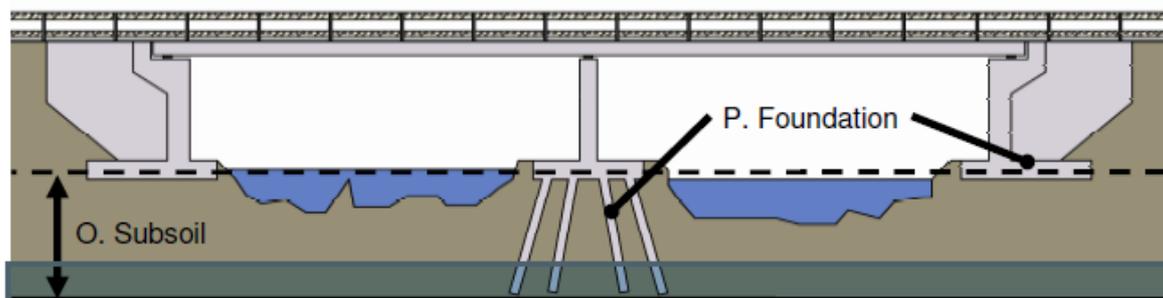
Subsoil and foundation with indication of possible areas for upgrading. O – subsoil; P – Foundations.
